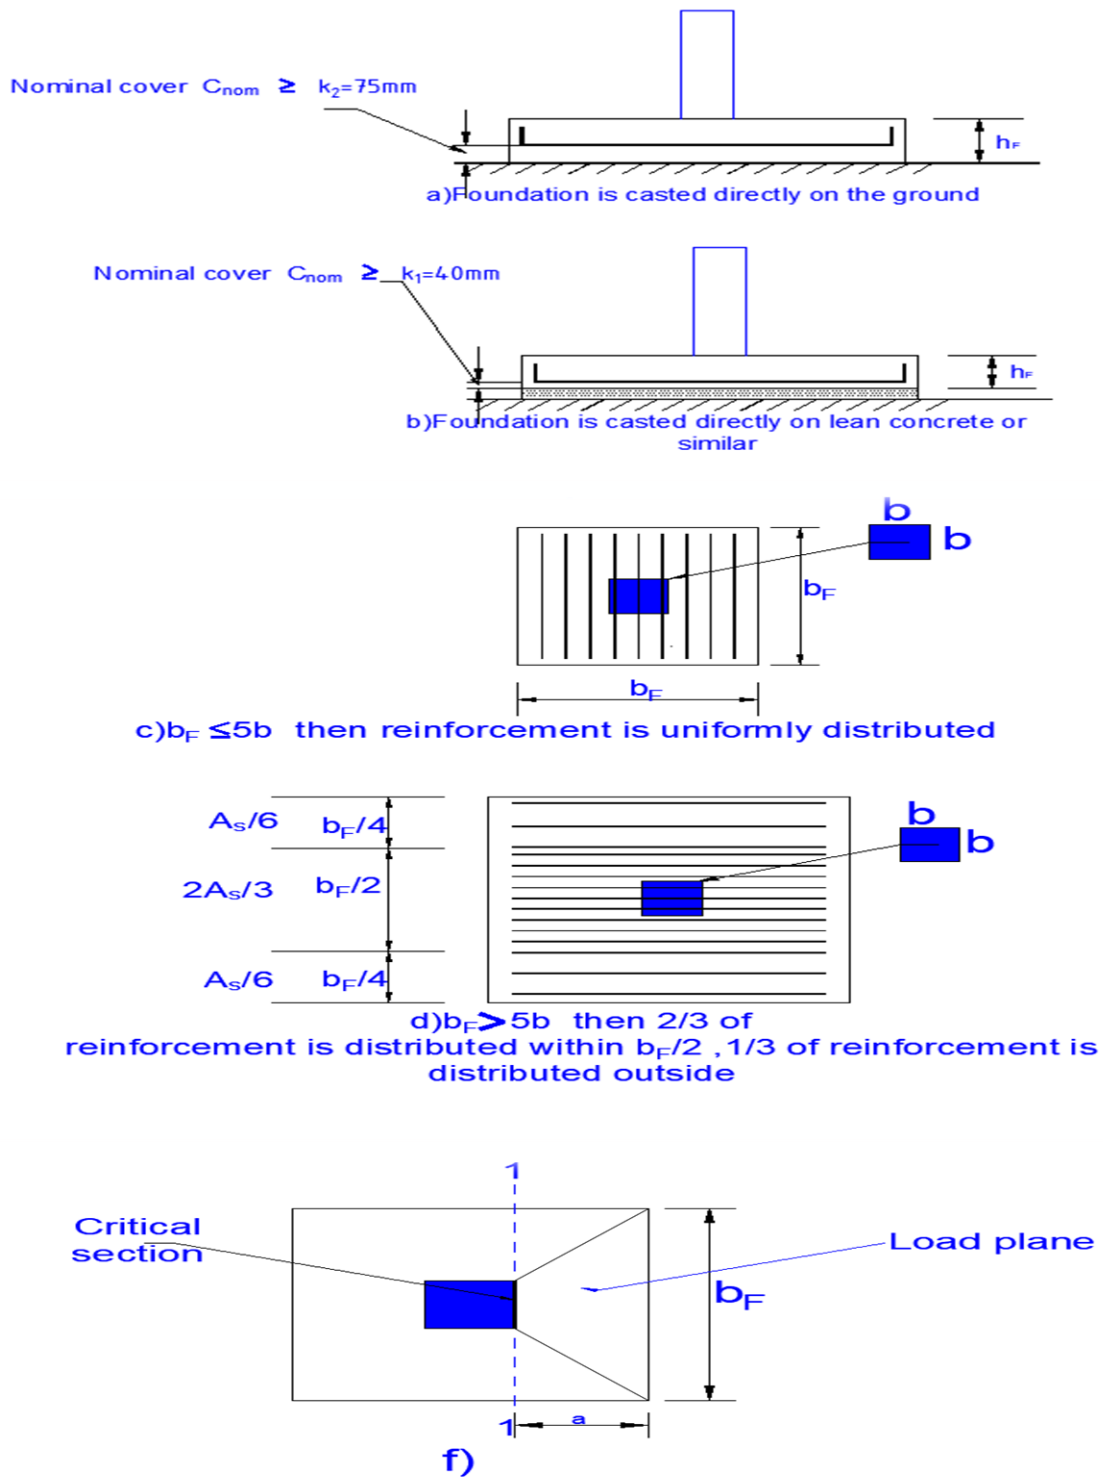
a and b) Cover requirement for wall foundation and column foundation based on EC2 c and d) Distribution of reinforcement for column foundation f) Critical section for shear pressure in column foundation [15]
